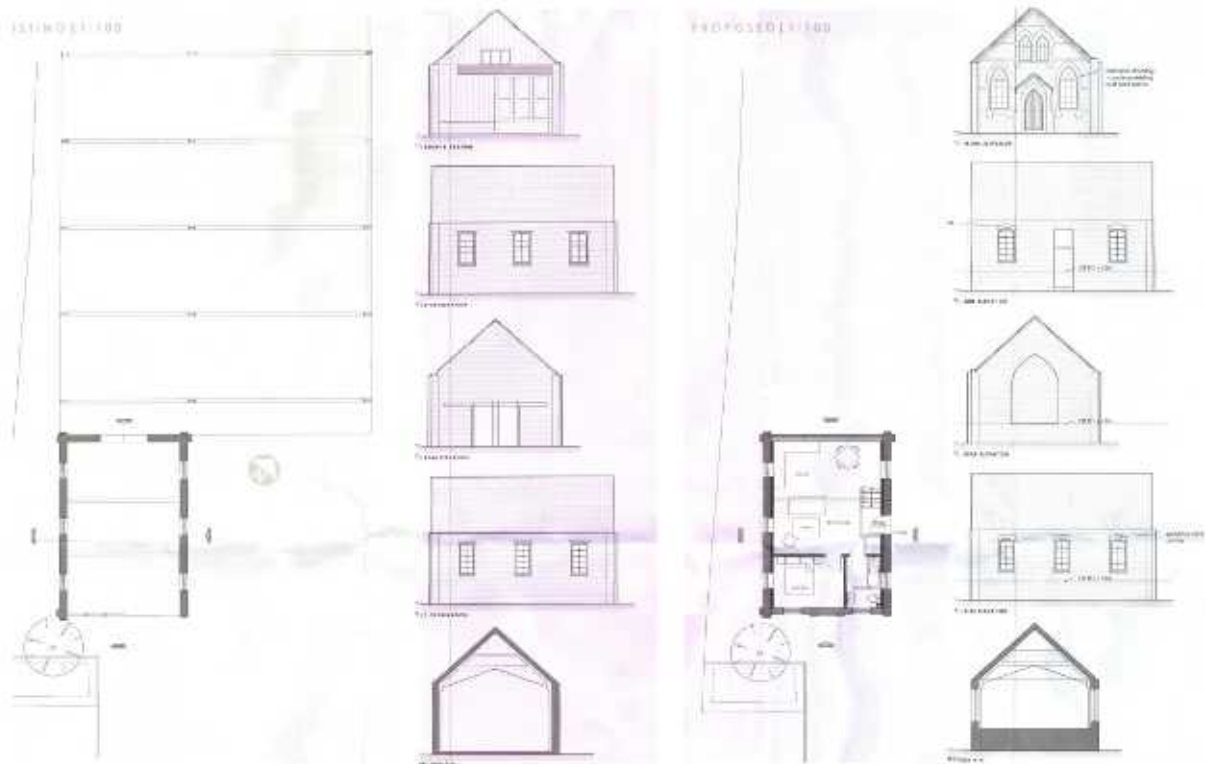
The original existing and proposed plans for the conversion to a dwelling.
